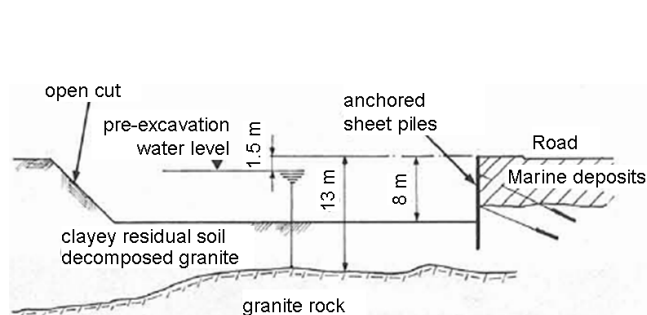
Section through an excavation in decomposed granite (after Davies 1984)
